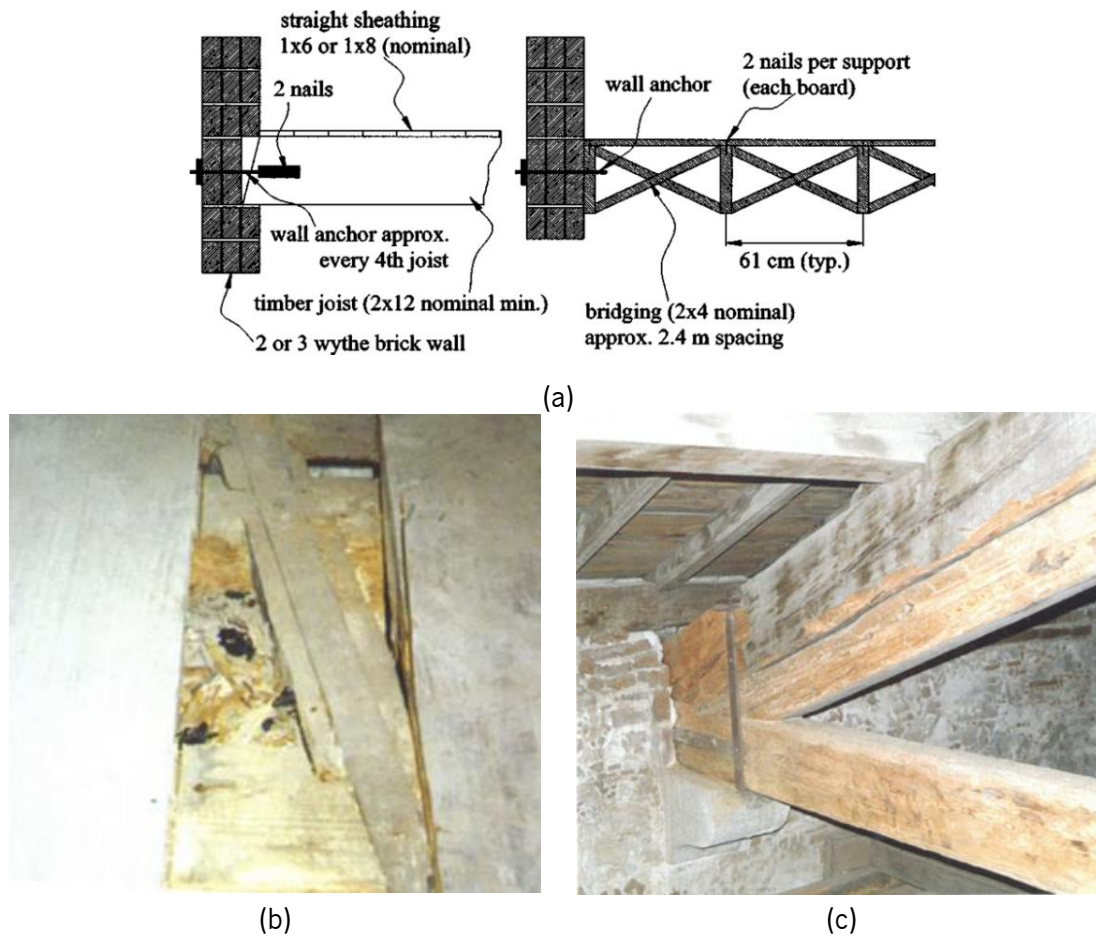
Metal anchorages between timber beams and masonry wall: (a) connections between the parallel or perpendicular joist and the wall (Peralta et al. 2004); (b) diagonal bar embedded into the transversal joists (Appleton 2003); (c) roof-to-wall connection (Cóias 2007).
